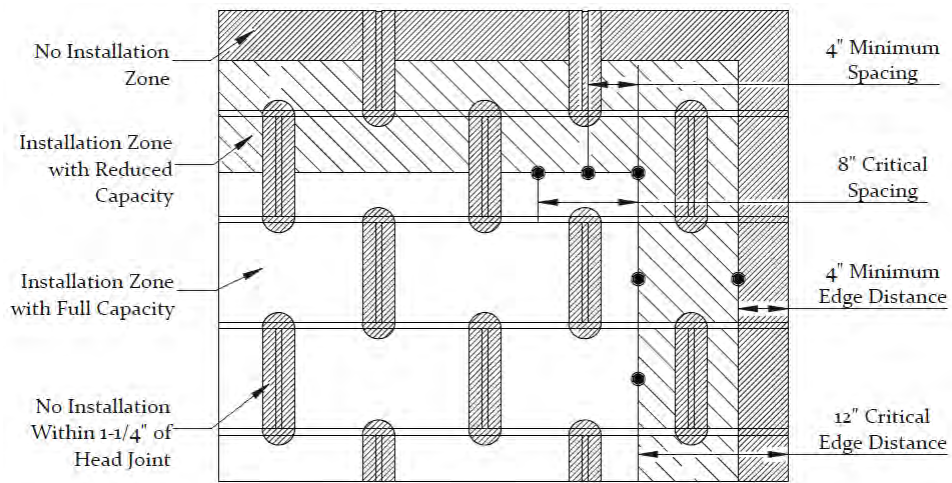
TRUBOLT+ WEDGE ANCHOR INSTALLED IN THE FACE OF FULLY GROUTED CMU CONSTRUCTION
